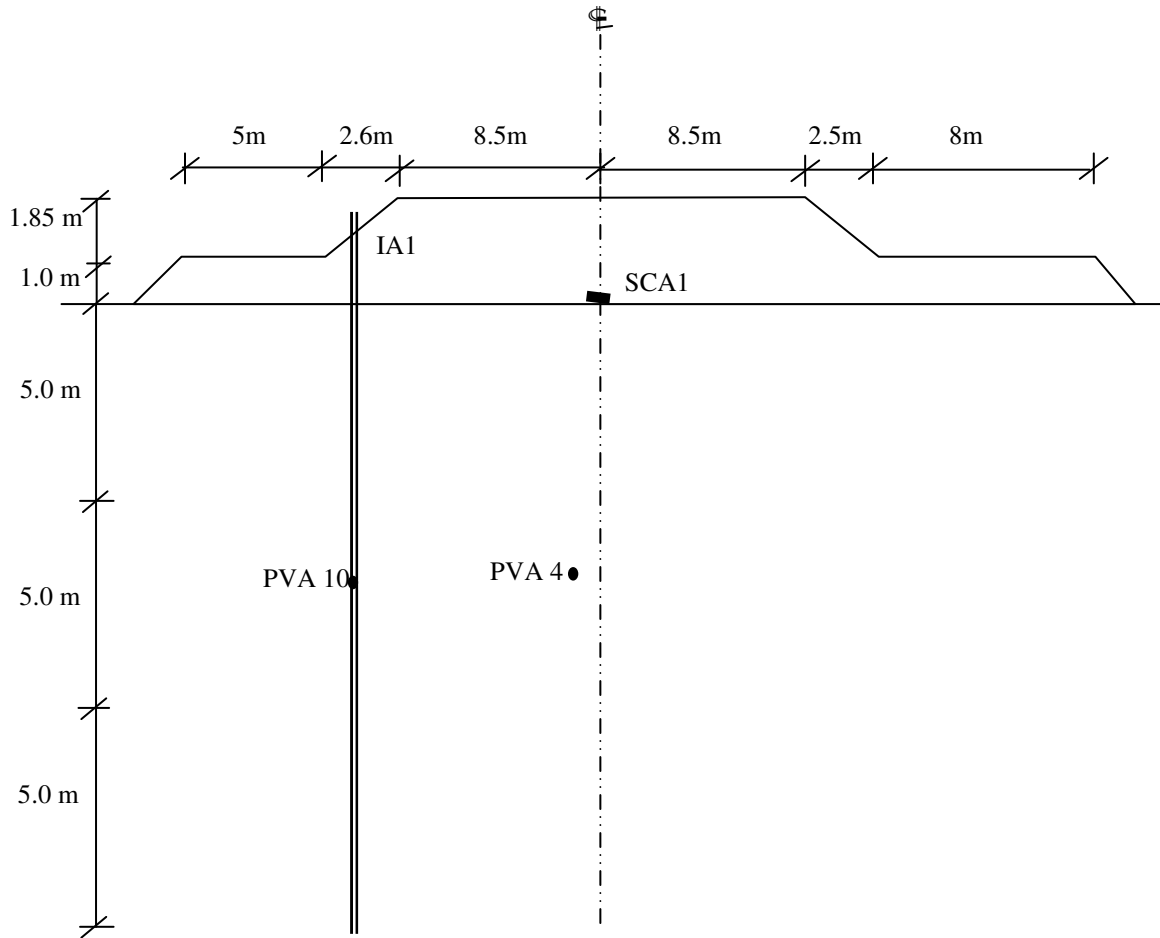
Instrumentation Layout for Section A (Elevation View)
